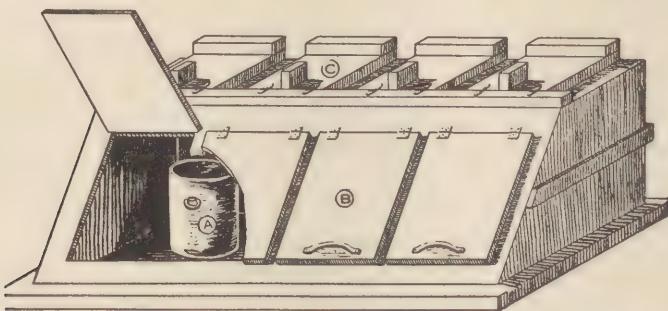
Pail latrine made from standard latrine box. A—Latrine pail. B—Hinged doors. (From Dunham's Military Preventive Medicine, 3rd Edition).
